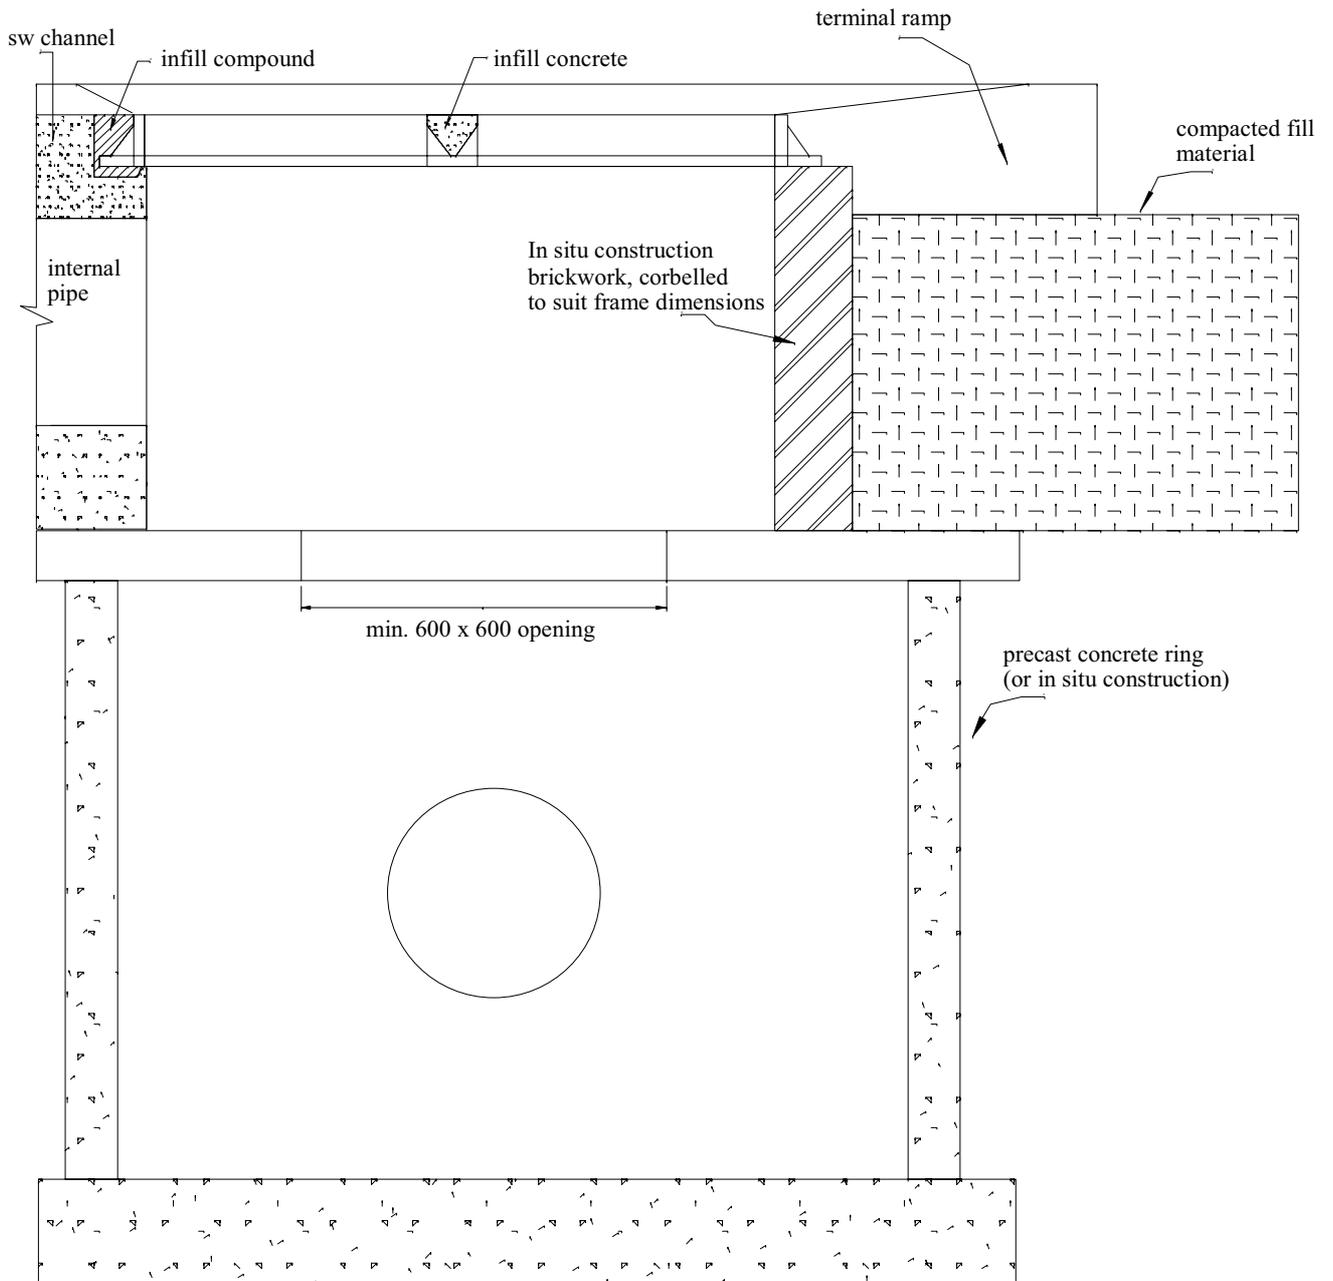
Example of Terminal Outfall - Longitudinal Cross-section
